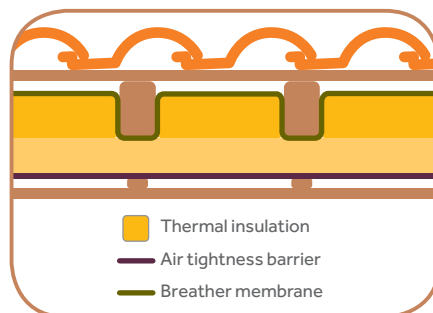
Diagram showing a possible arrangement for thermal upgrade where roof finishes are being retained.
